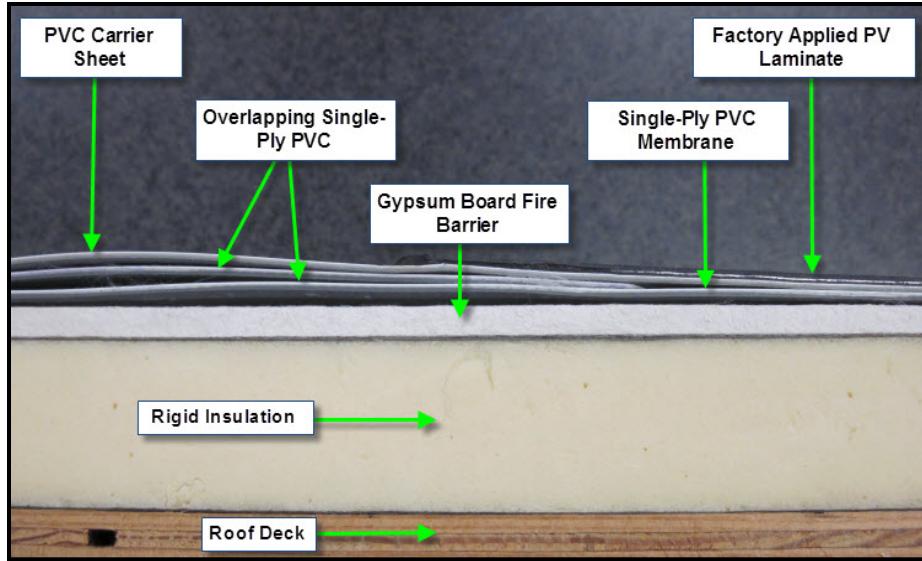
Cross-section of BIPV roof assembly without the conduit.
